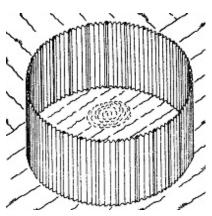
A ring of steel-sheet piling can alternately be used to ring the boil, if conditions permit.
